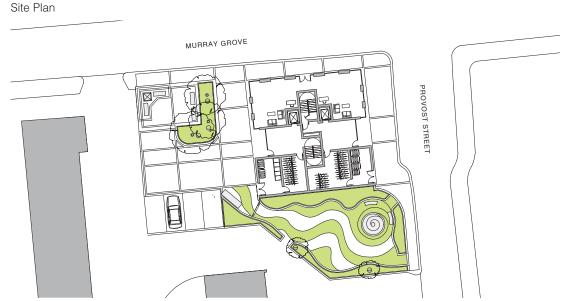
Site plan Source: Waugh Thistleton Architects
